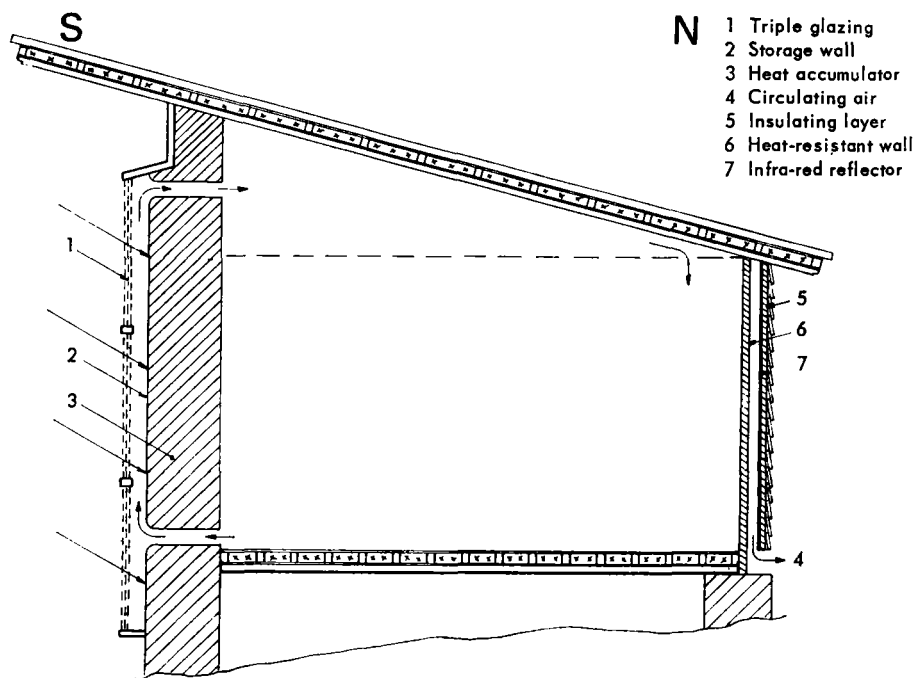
Prototype of unit-construction dwelling with solar heat collector and thick ground-to-roof storage walls (CNRS, Montlouis).
